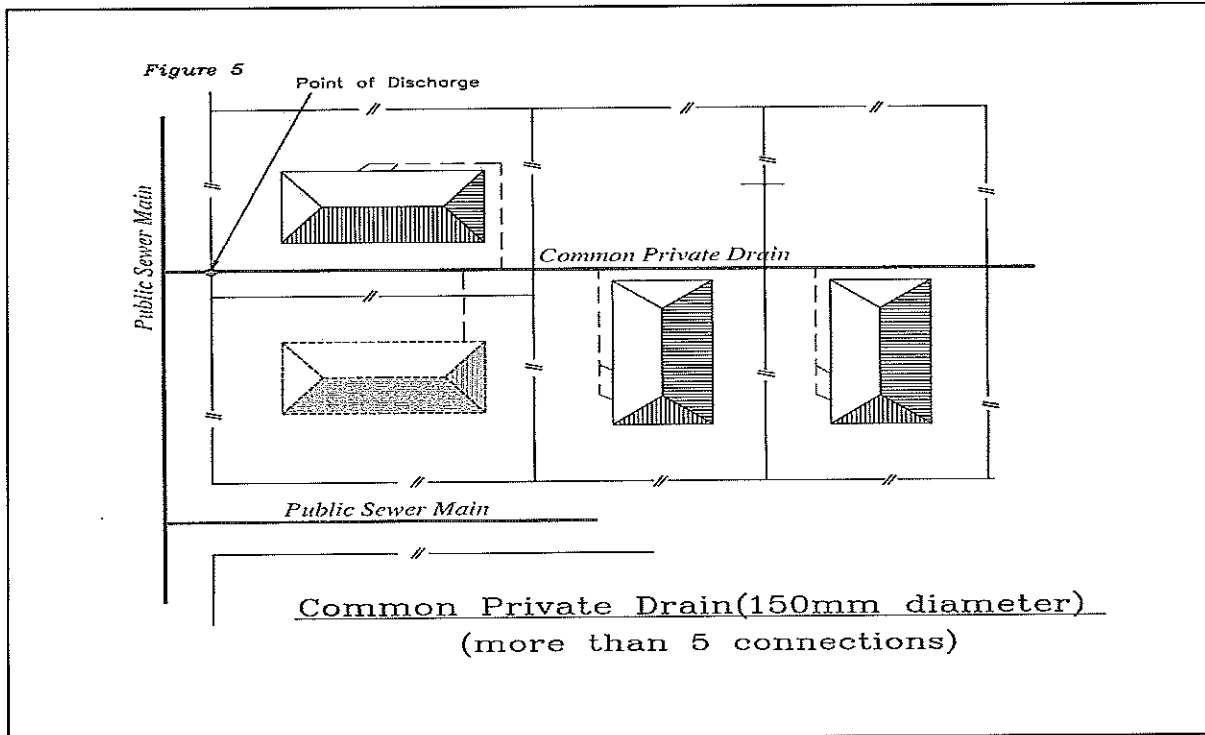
Typical layout at point of discharge – Common private drain–150mm diameter
